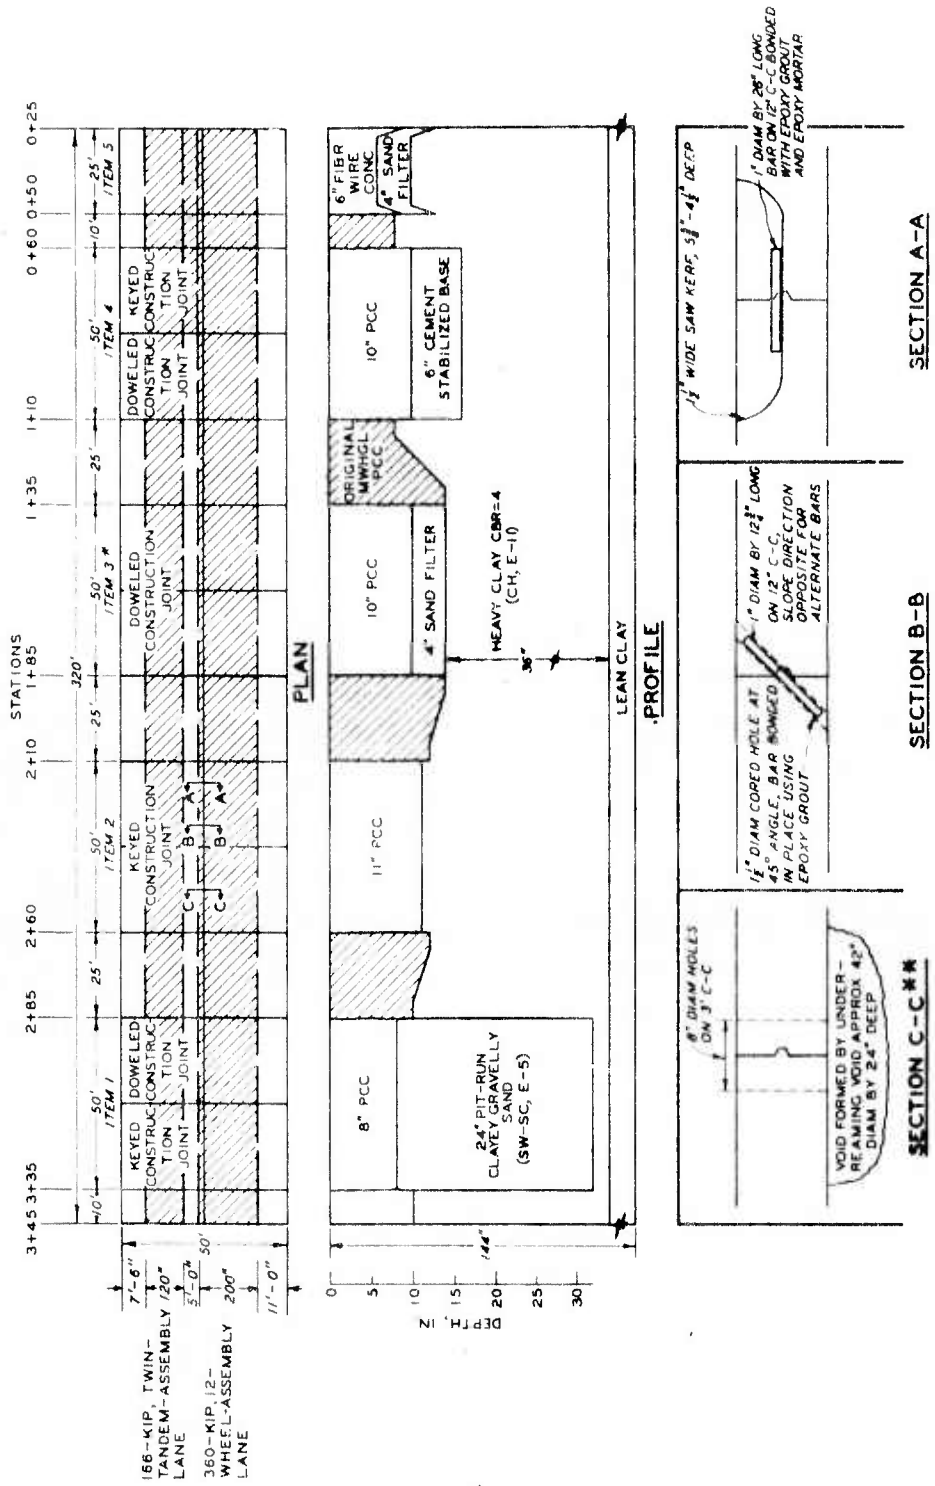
Plan and profile of test section showing three methods used to strengthen keyed longitudinal construction joints.
